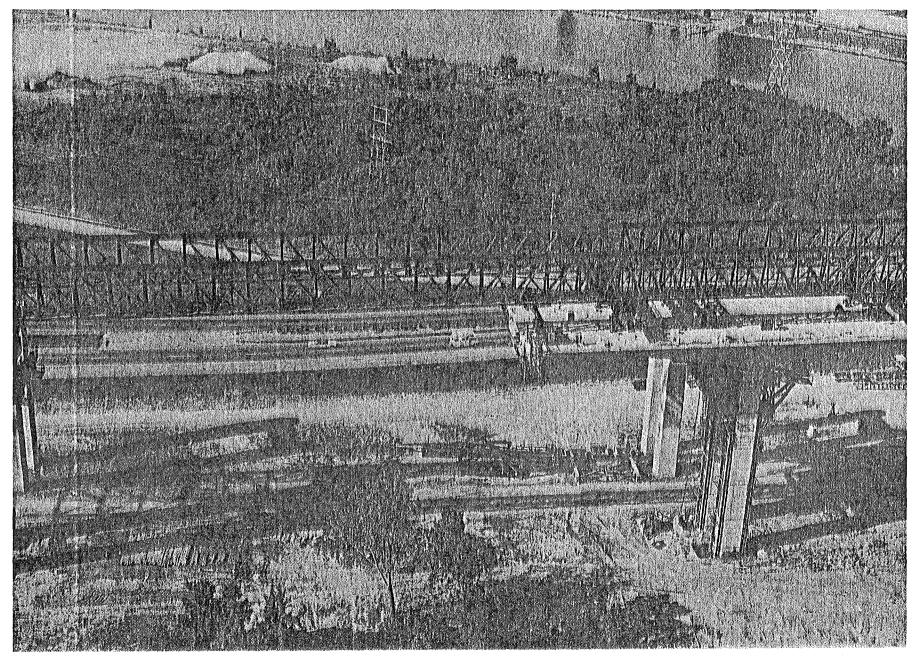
$\,$ Aerial view of Launching Girder at Pier 10N $\,$
